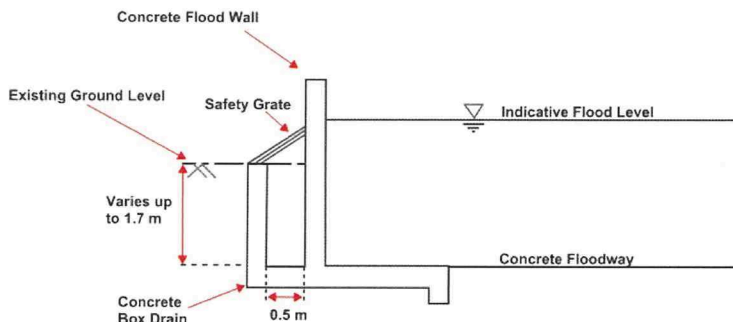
Typical section through the concrete section of floodway, showing concrete flood wall with concrete box drain (view looking north/upstream).
